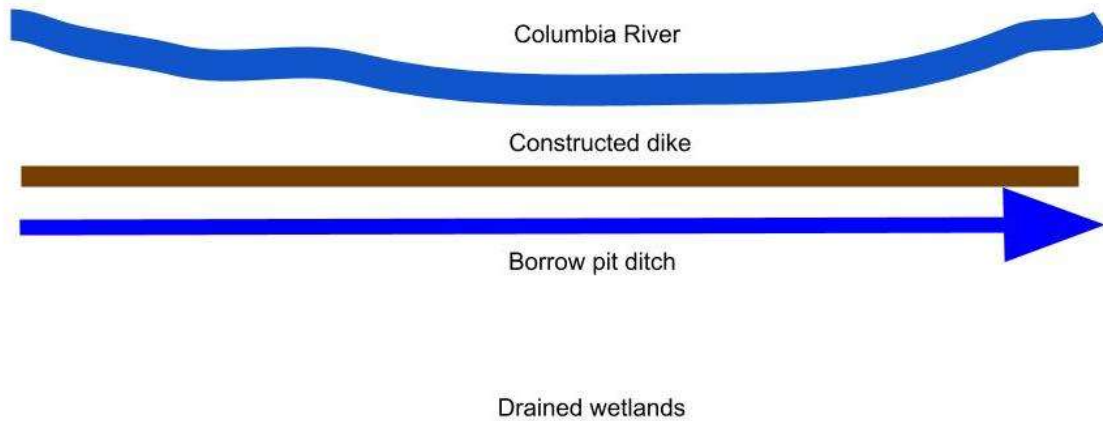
Existing constructed dike and borrow pit ditch (typical plan view).
